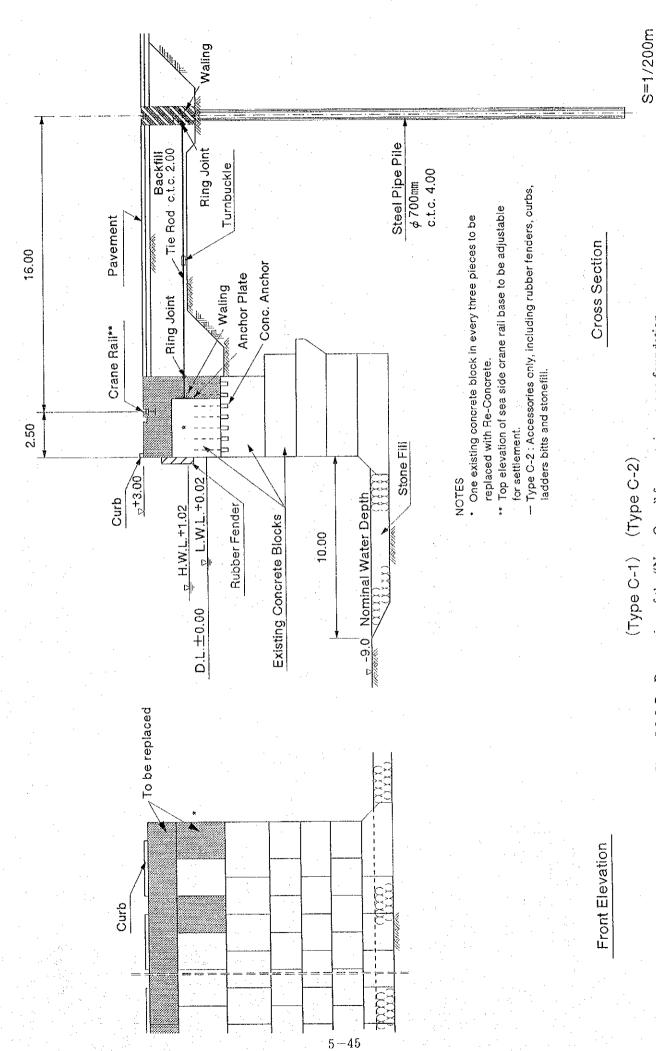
Renovation of the "New Quay" for container crane foundation
